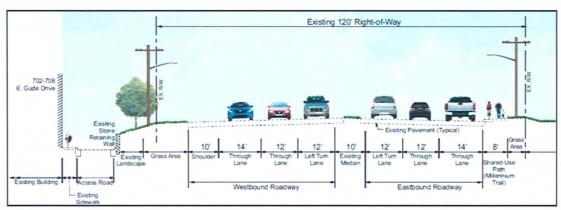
Alternative 1: No-Build. Existing Conditions along East Gude Drive at Section B-B, approximately 2,000' east of Calhoun Drive.
